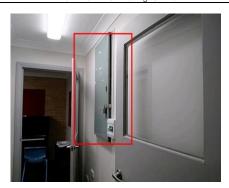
Result: Asbestos - Presumed Positive Location-Level: Interior - Ground Floor Room-Location: Electrical distribution cupboard Feature-Material: Internal insulation Item No - Risk Rating: 2 - Low
